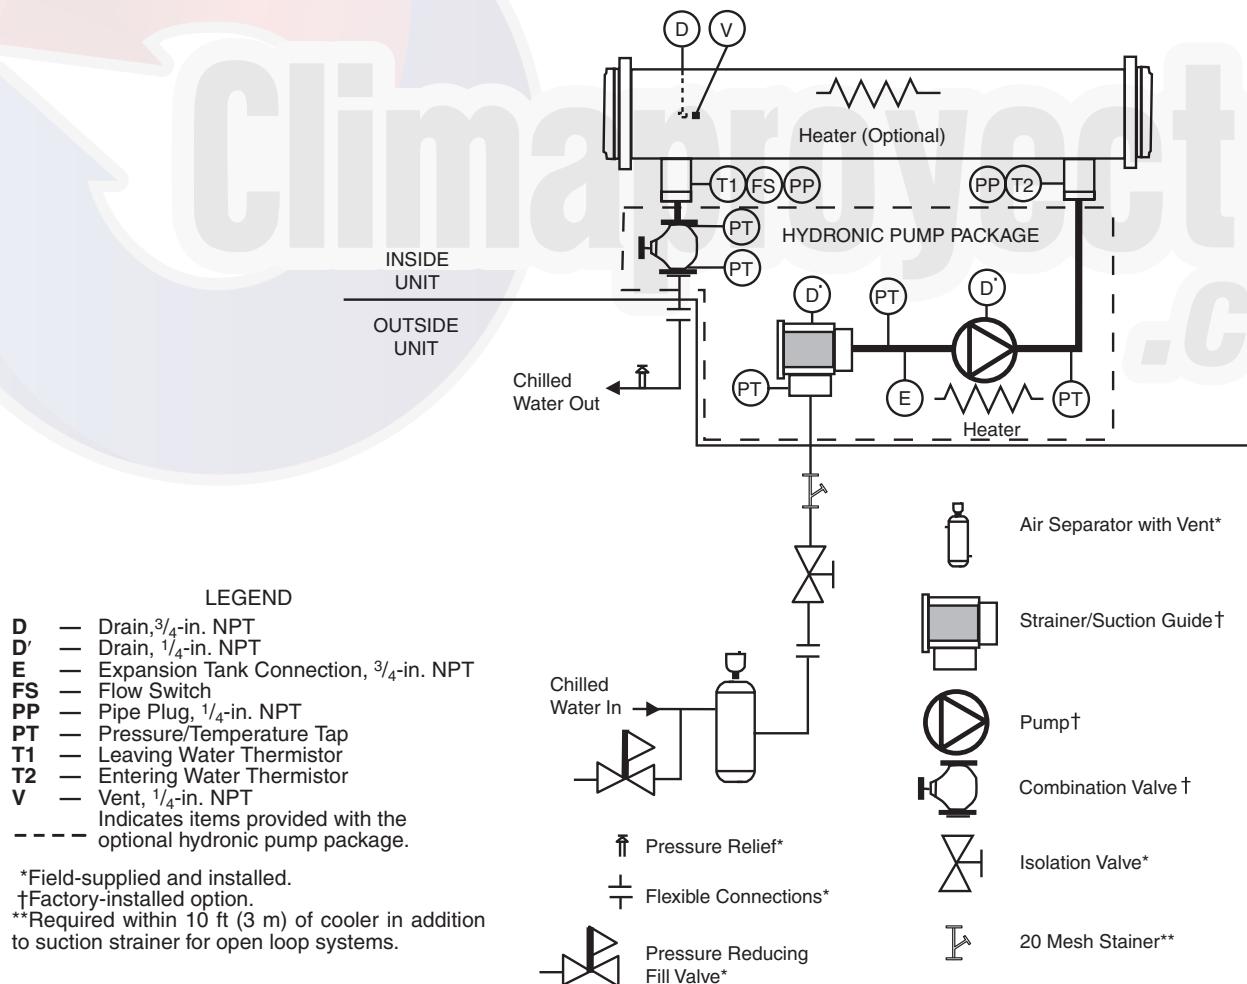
Typical Piping Diagram on 30RB Units with Hydronic Package — Single Pump
